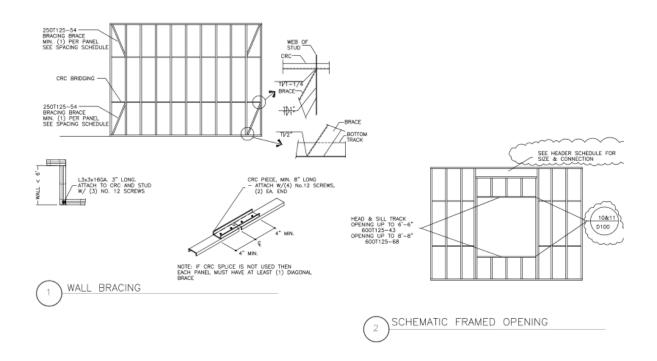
From Structural Sub drawings C200. It is the only hint of Bearing Wall components/design shown from the Infinity System.
